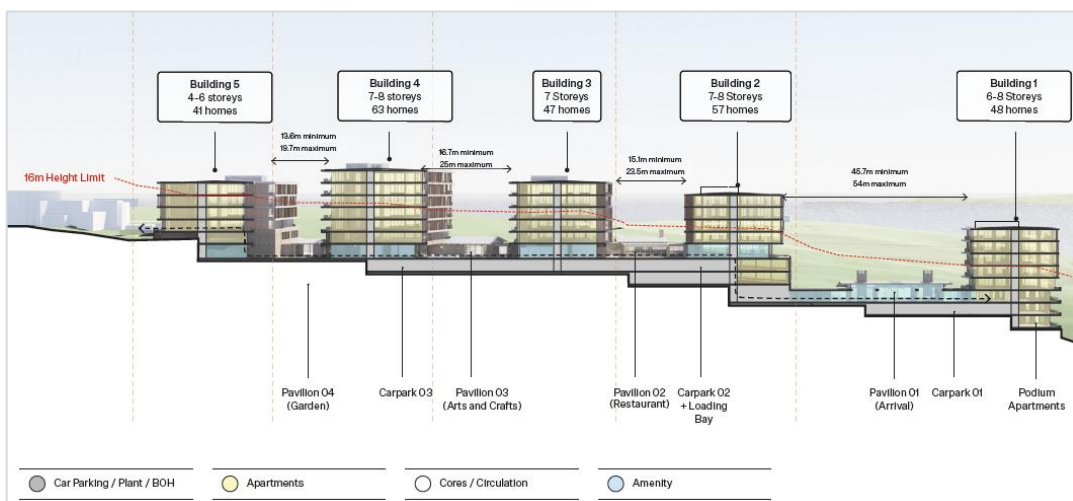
Section of the proposed buildings facing north relative to Site topography.
